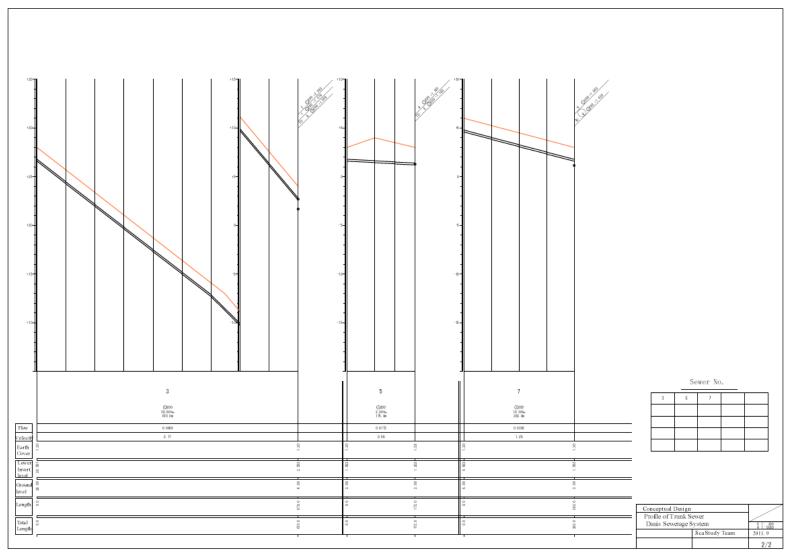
Profile of Trunk Sewer (Dauis Sewerage System)
